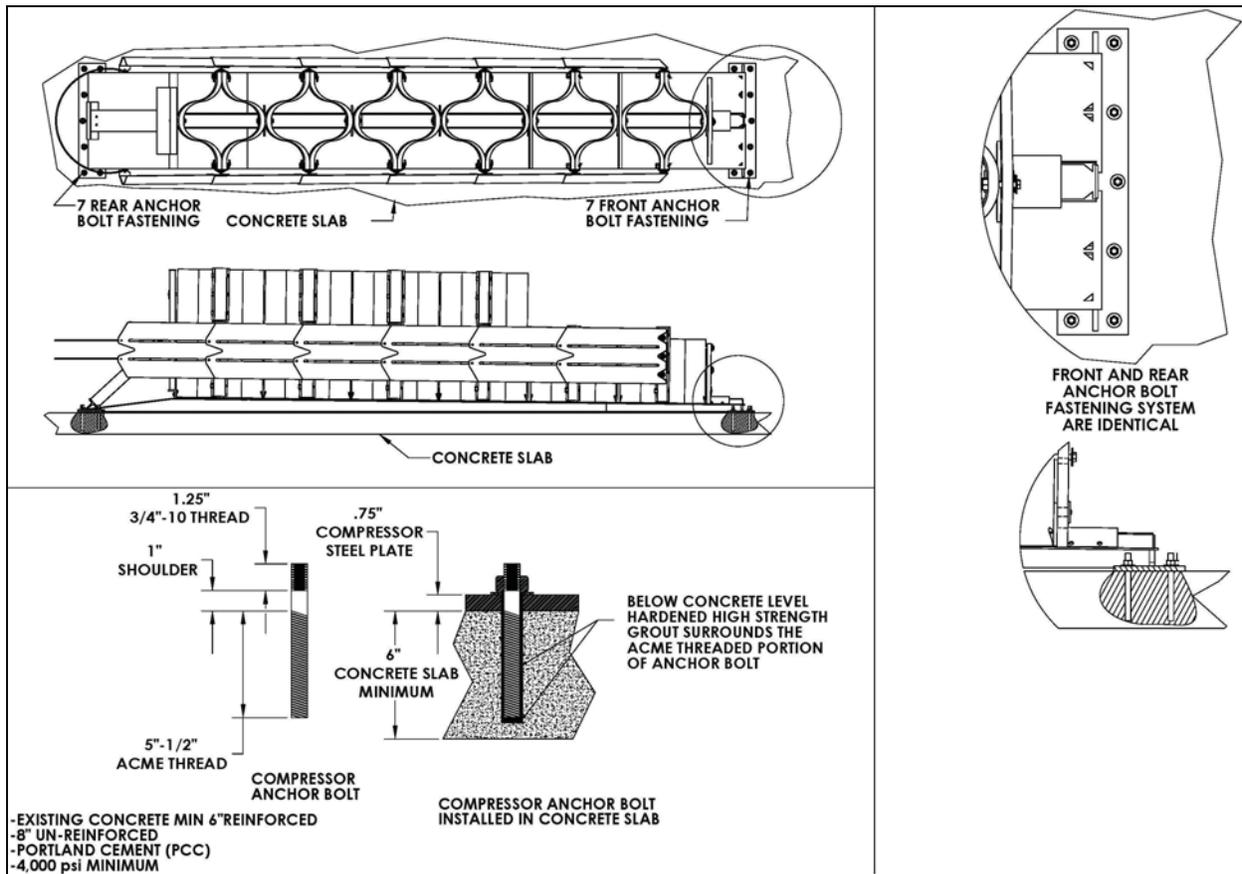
Compressor System Concrete Anchor Bolt Attachment
